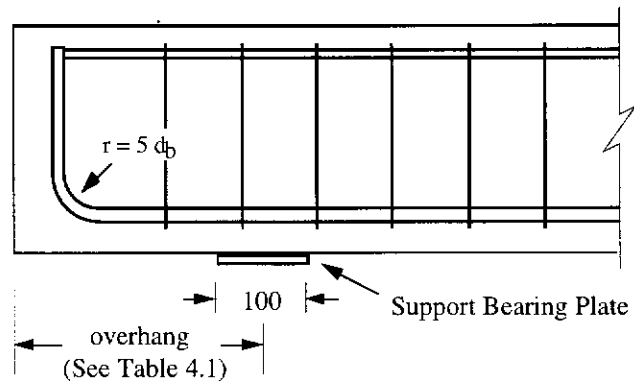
Anchorage of Longitudinal Tensile Bars
